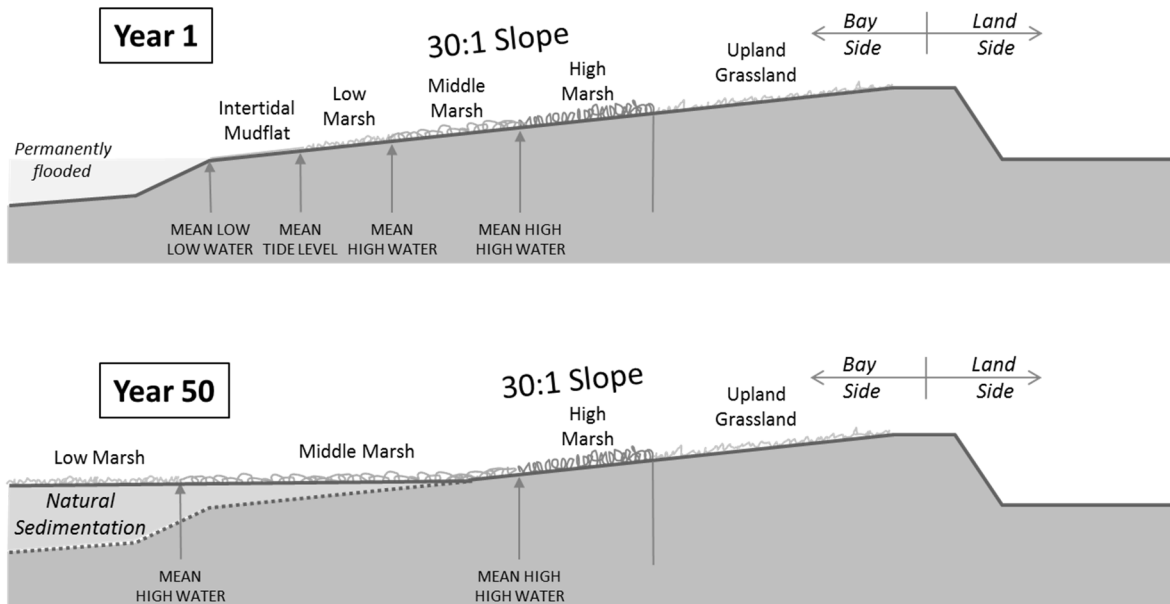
Levee with ecotone zone (adapted from USACE2015: Figures 3.6-3 and 3.6-4).
